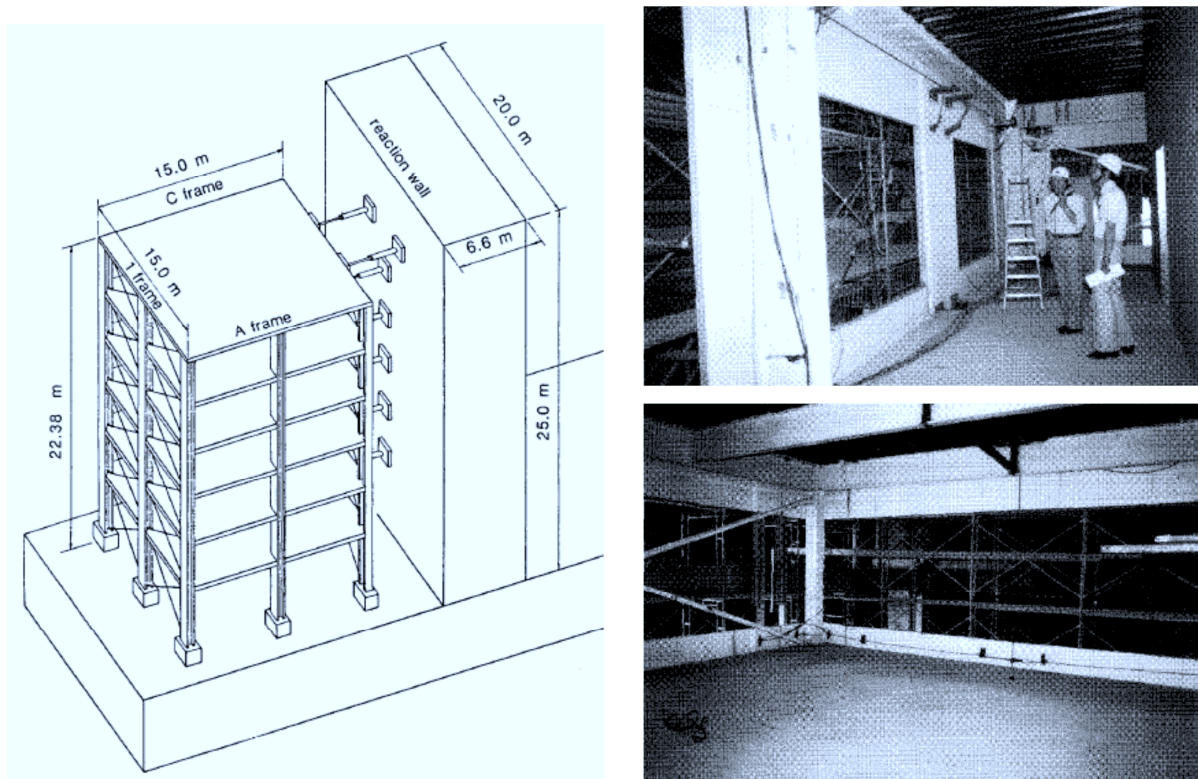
Six storey test frame (left) and precast concrete cladding connected to frame (right) (Wang, 1987)
